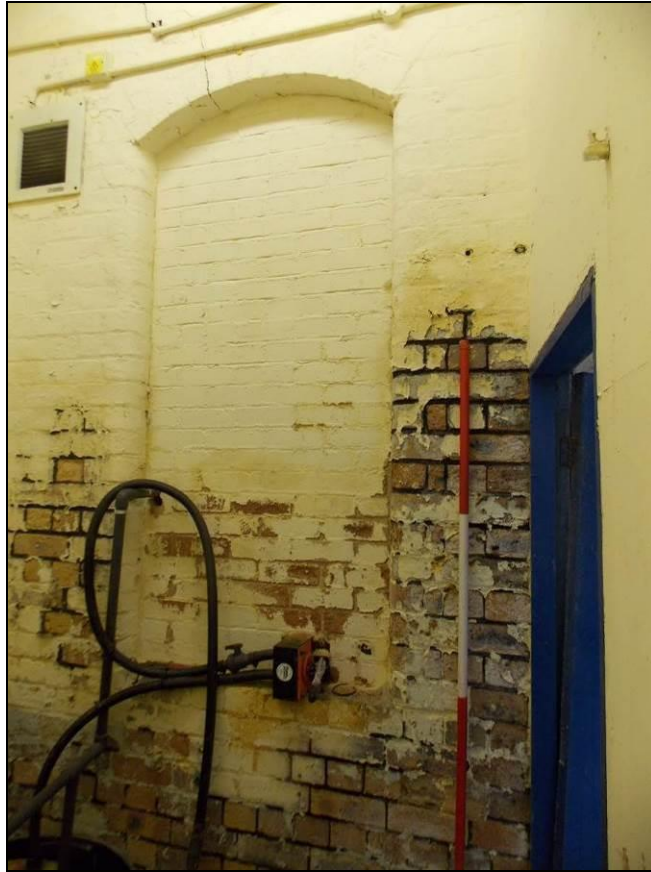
Brick-up window opening within the eastern side of the south wall, looking south (scale 2m).
